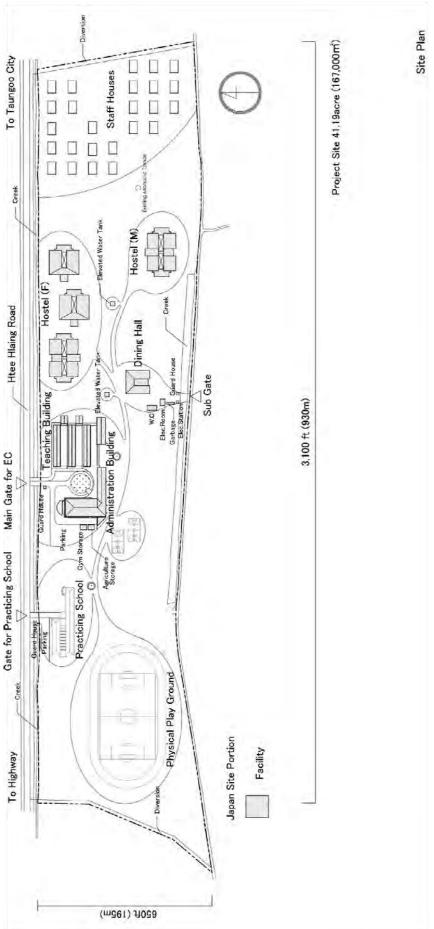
shows a draft layout of the facilities to be constructed which is subject to modification keeping the specification summarized in Table 2.2.1 unchanged.
